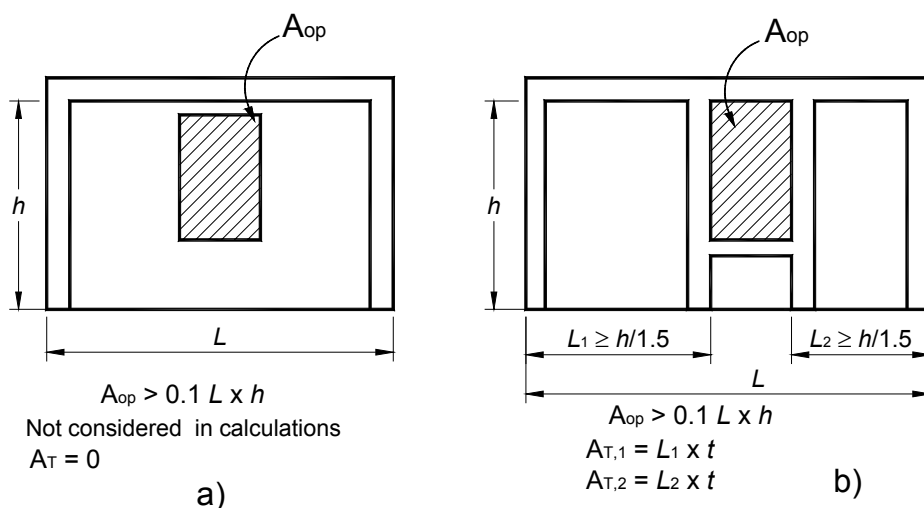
Masonry wall with a large opening: a) this is an unconfined panel - to be disregarded in wall density calculations), and b) RC tie-columns are provided at the opening and two confined wall panels can be considered in the wall density calculations.
